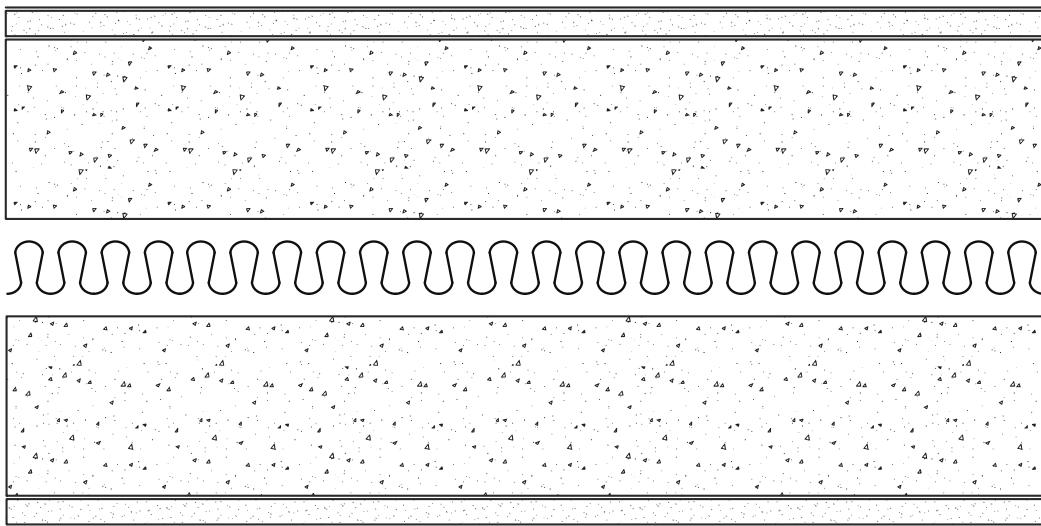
75 mm thick autoclaved aerated concrete wall panel (method 2)
